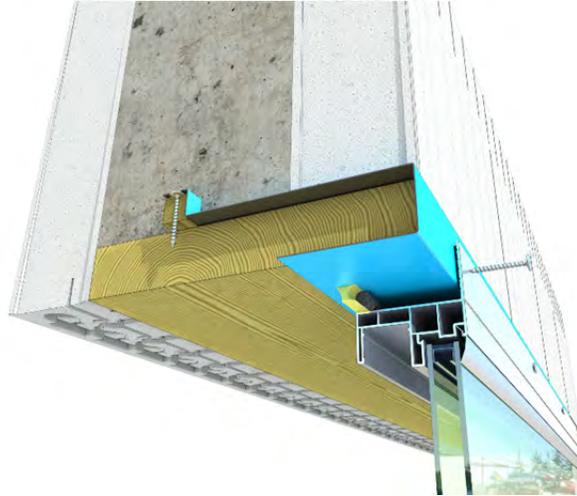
Hybrid Wood Buck-out extends to exterior face of ICF wall
